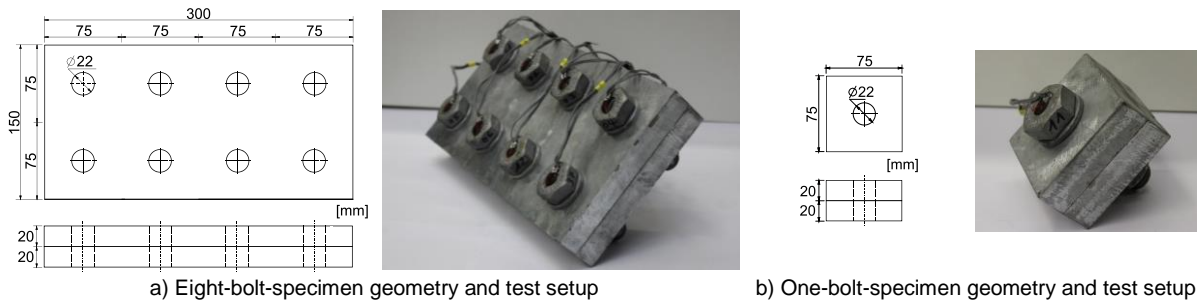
Test specimen geometry for the relaxation tests of the bolted connections
